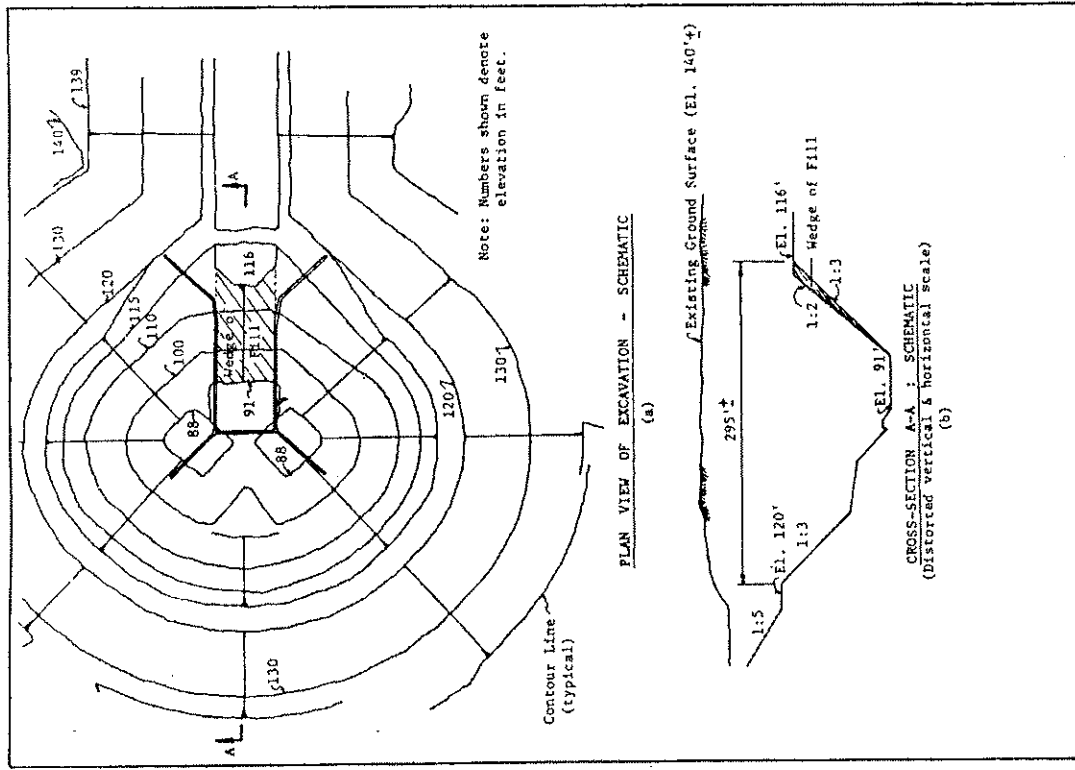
(a) Schematic plan view of excavation for Control Structure, Ascalmore Creek — Tippo Bayou, Mississippi.
